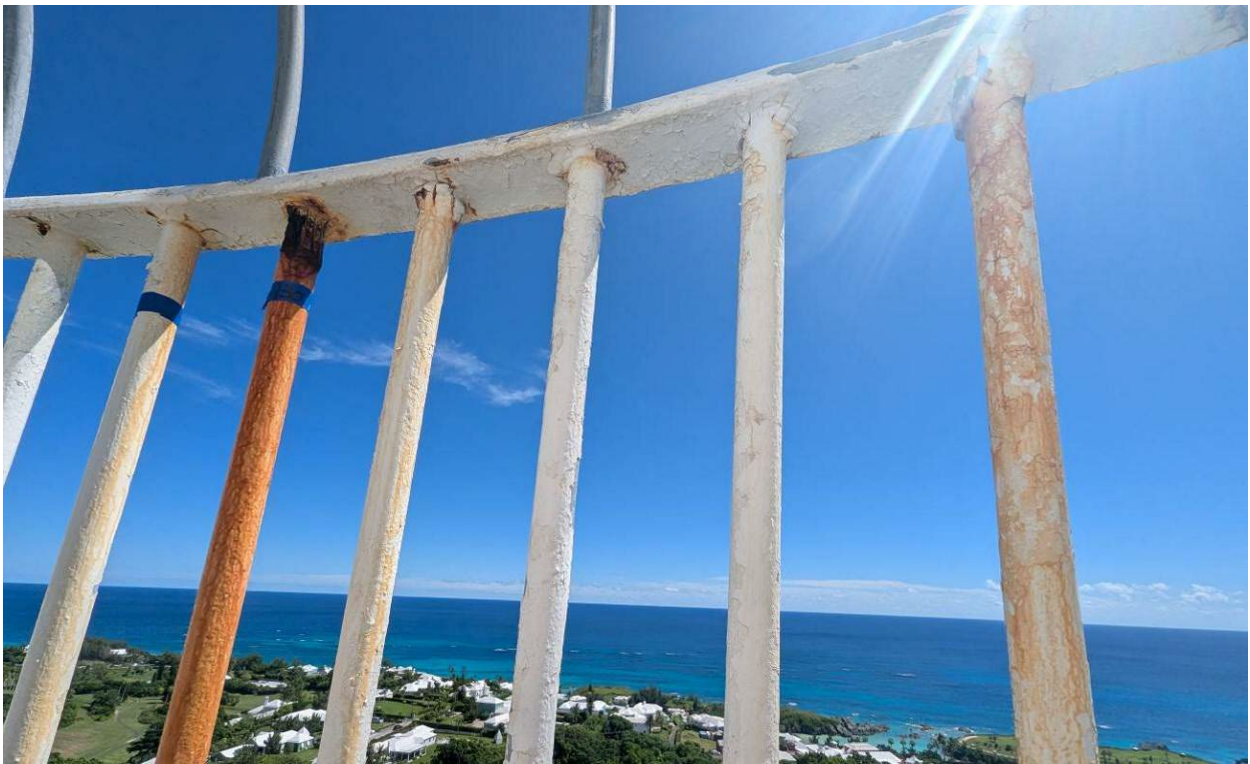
Lower railings connection to intermediate railing in Section 6 (Bars 101-106)
